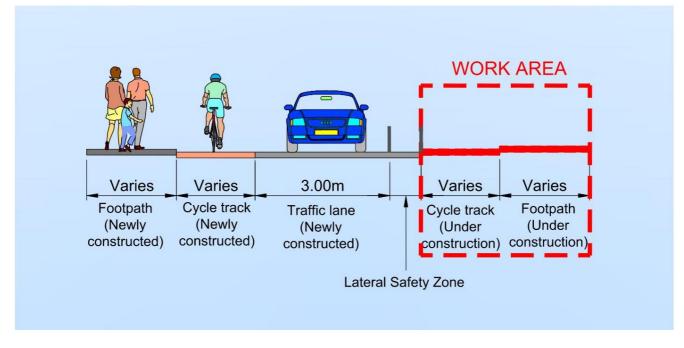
Traffic Management Cross Section, Section 5e – Stage 2
